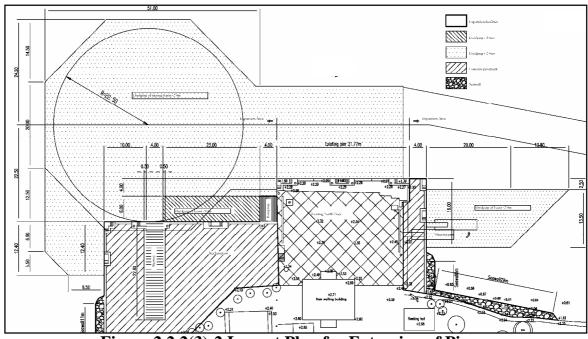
(3)-2 Layout Plan for Extension of Pier
